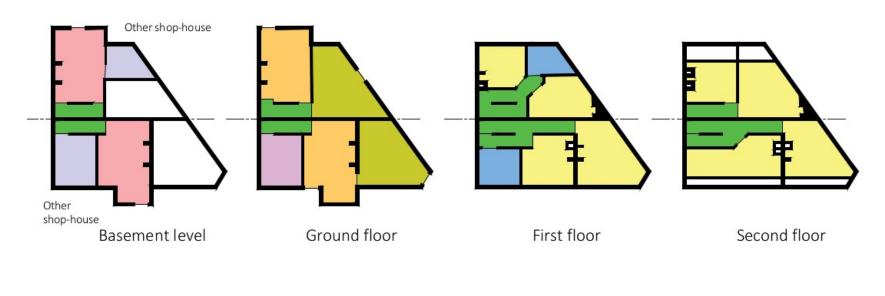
'Other' shop-houses with unique plan layouts. In one house the first floor has an unusual arrangement where the bedrooms are separated by a bathroom, and the other has three rooms in a linear arrangement on the ground and first floors. In both cases, the shop has a splayed form that is aligned with the street (Redrawn from original plans by Carby Hall and Dalby 1907).
